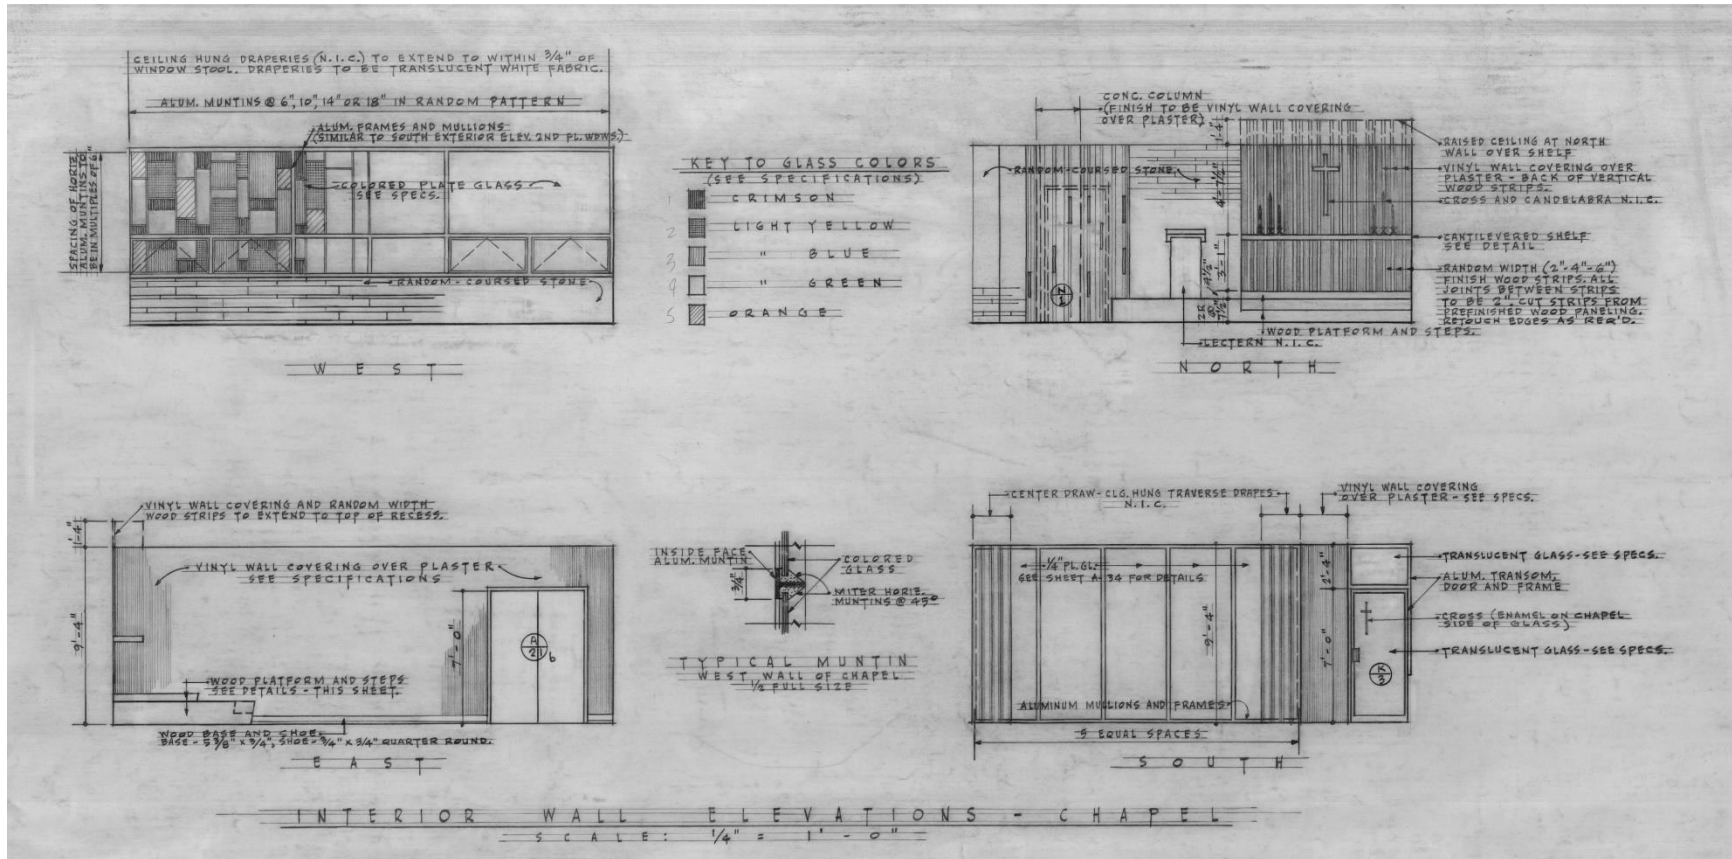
Detail of Chapel interior wall treatments (Turley 1958; Sheet No. A-36).
